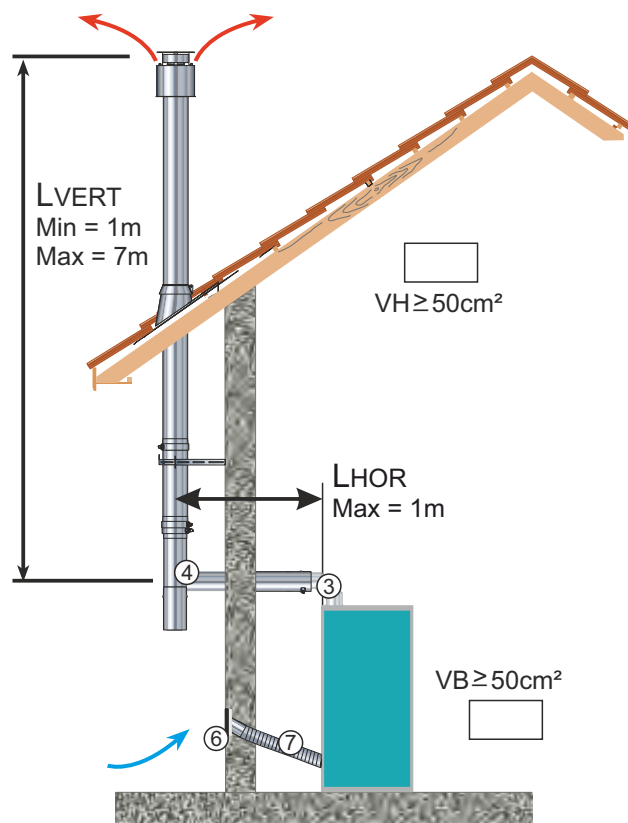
Fresh air from the facade - wall grille, chimney outside the boiler room
